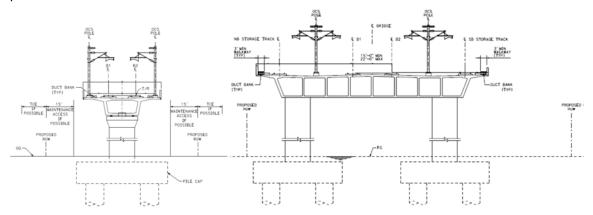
Typical Section in Subsection San Jose Diridon Station Alternative 1
